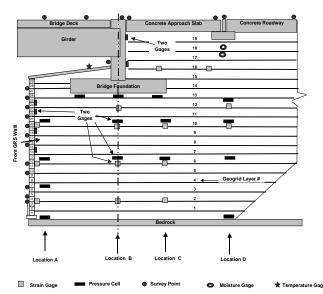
Cross section of the Founders/Meadows Bridge abutment showing the geosynthetic reinforcements and instrumentation plan (Zornberg *et al.* 2001b)
